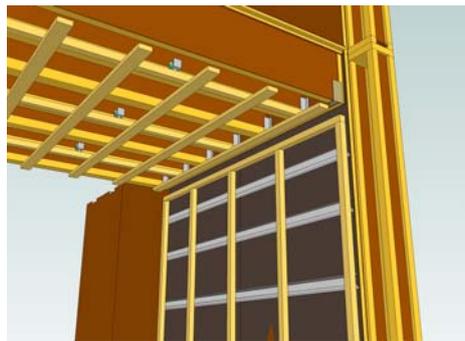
The floor structure from below and its connection to the load bearing walls including the sound reducing ceiling and wall covering.
